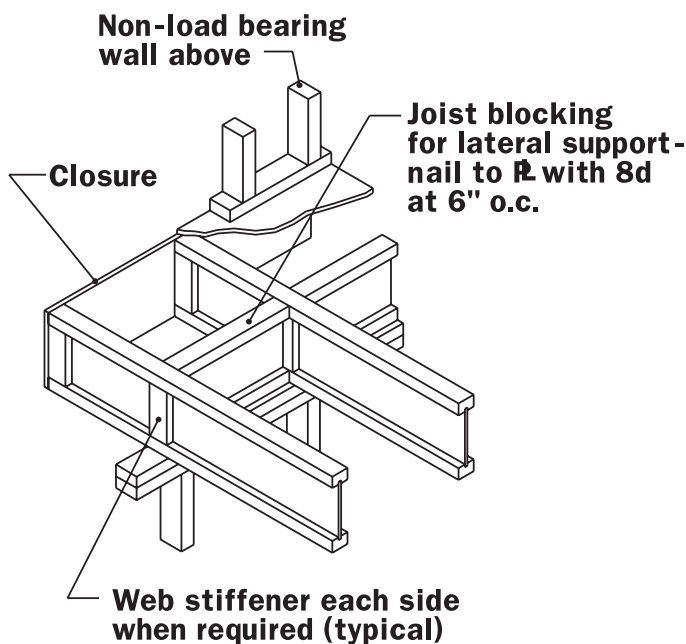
Continuous Cantilevered I-Joist Over a Bearing Wall Supporting a Wall Above
